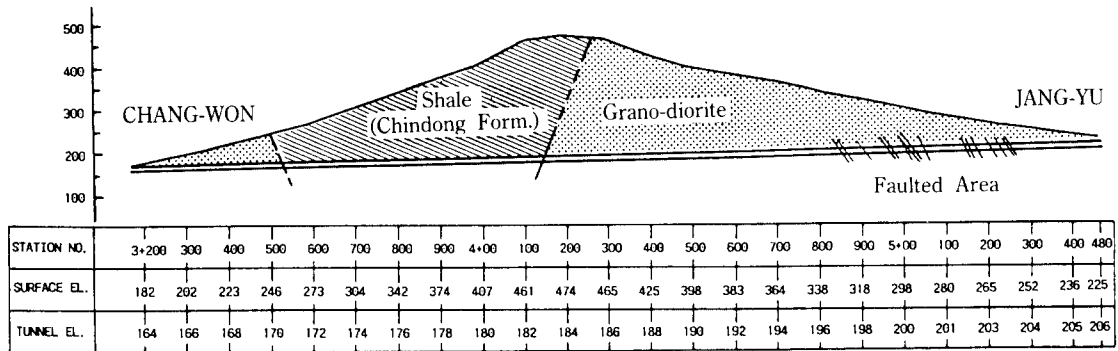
Longitudinal section of Bulmosan road tunnel.
